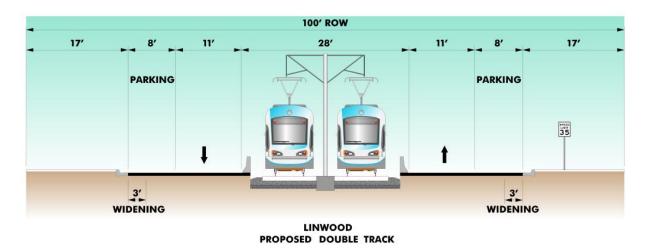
Enhanced Streetcar Linwood Blvd Typical Section
